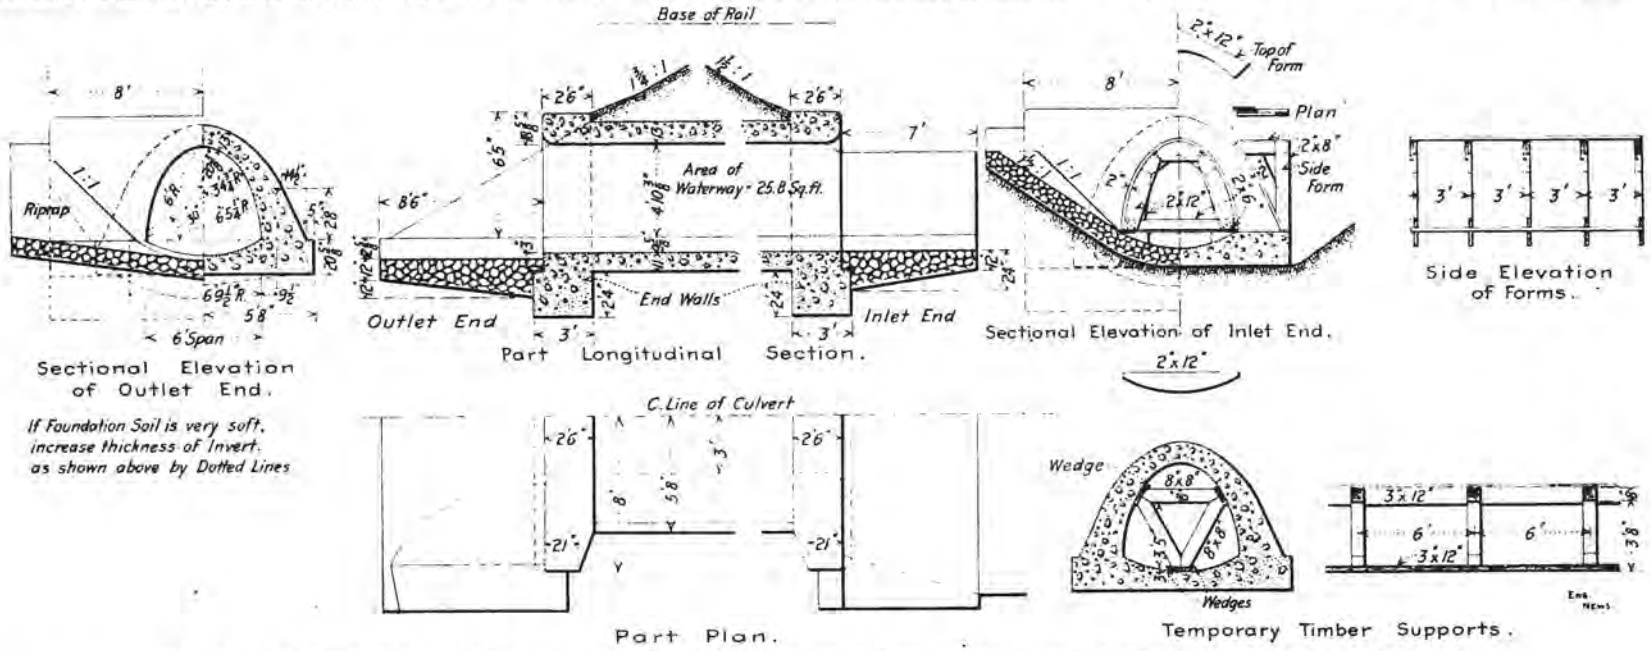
CONCRETE CULVERTS UNDER HYDRAULIC EMBANKMENTS; CHICAGO, MILWAUKEE & PUGET SOUND RY.
